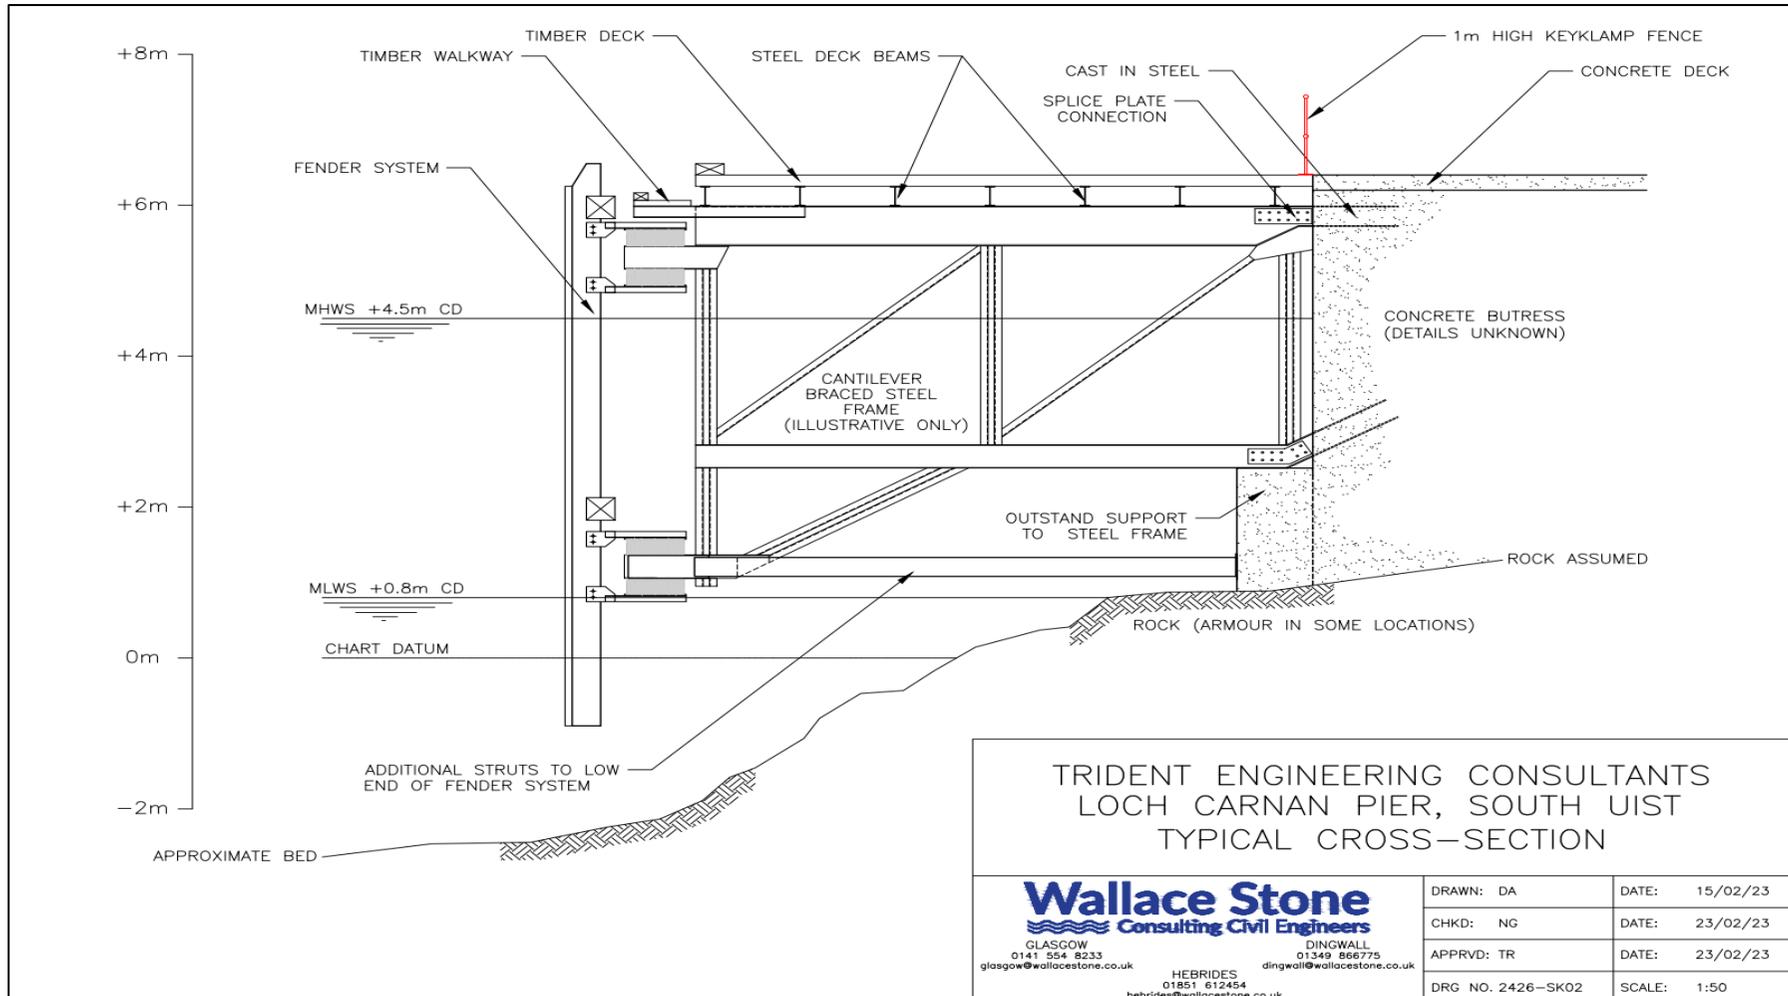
Cross section of typical frame for Loch Carnan jetty
